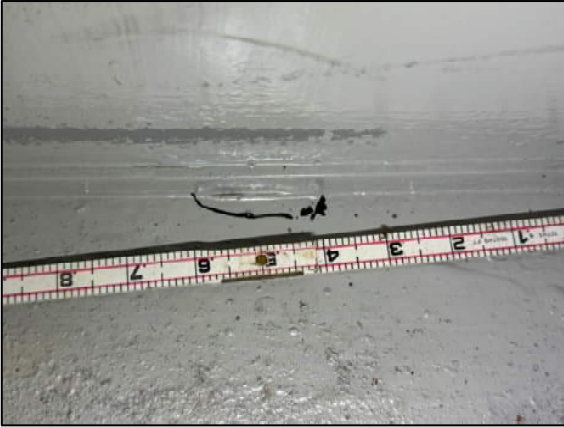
Typical incomplete removal of tack welds on Pier Cap 5, some material remaining
